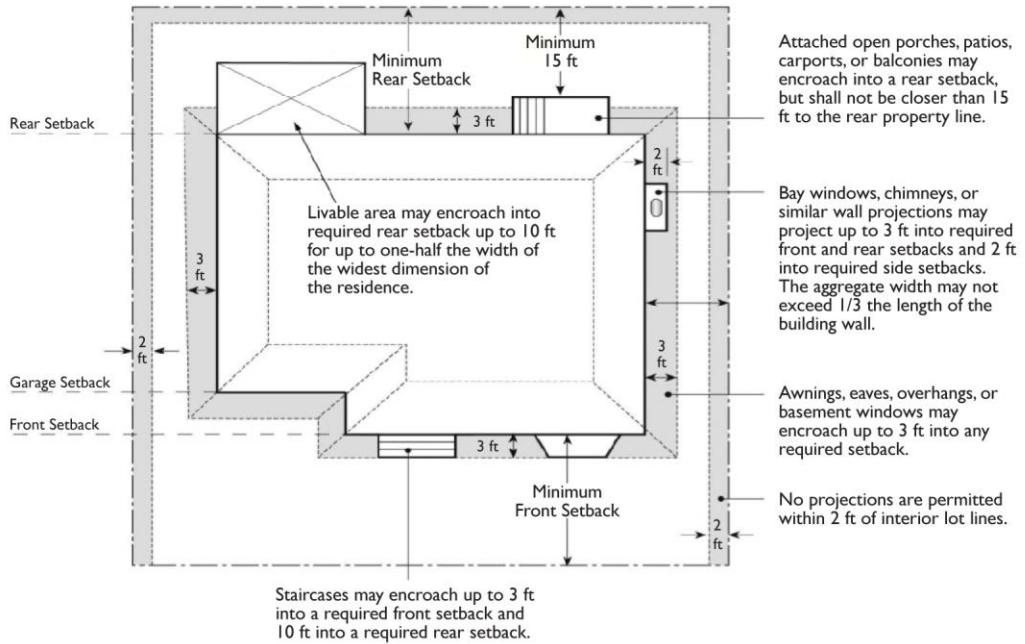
D(1): BUILDING PROJECTION
